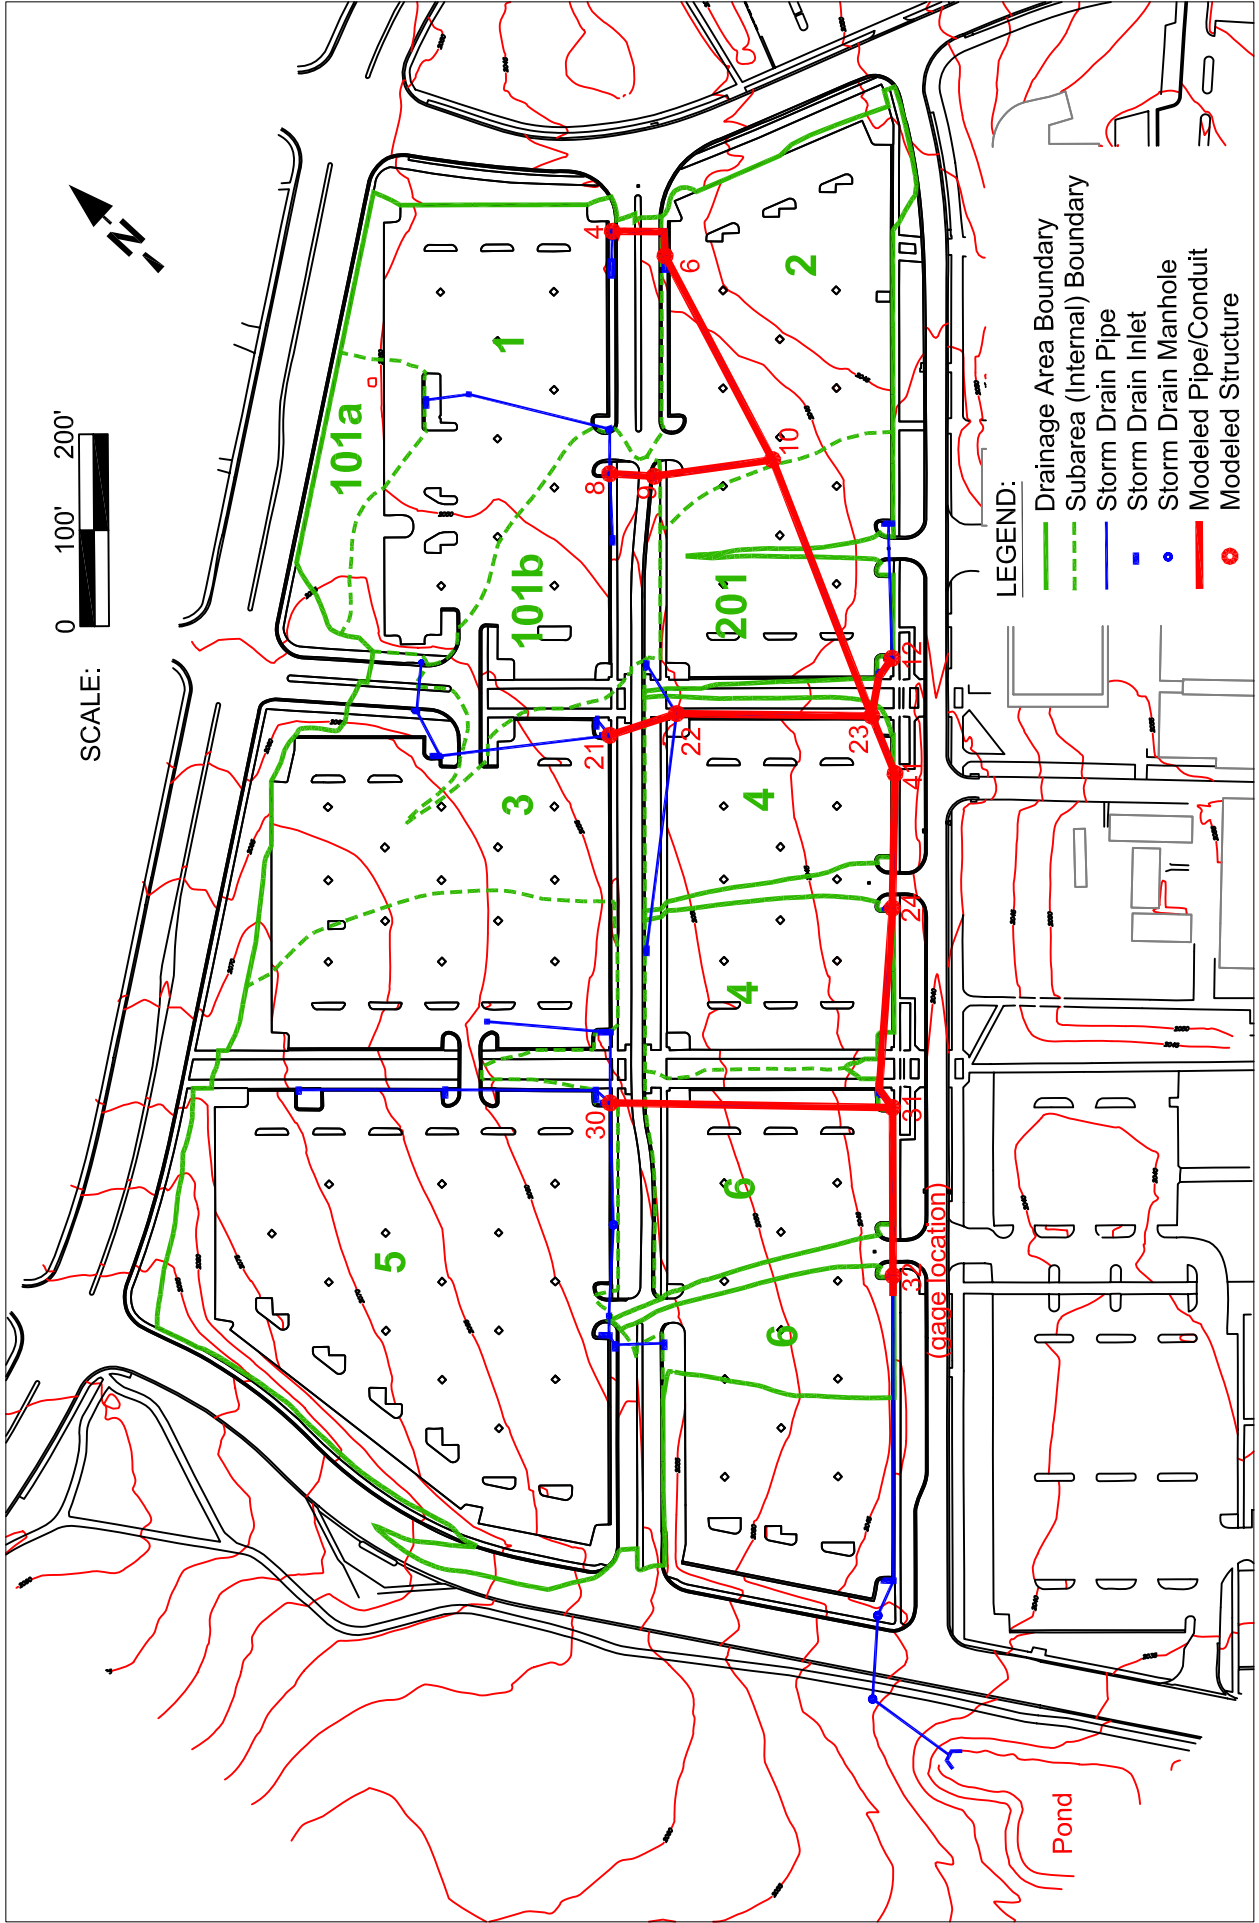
Virginia Tech Parking Lot Hydrologic Model Layout (Source: University Planning, Design, and Construction Services)
